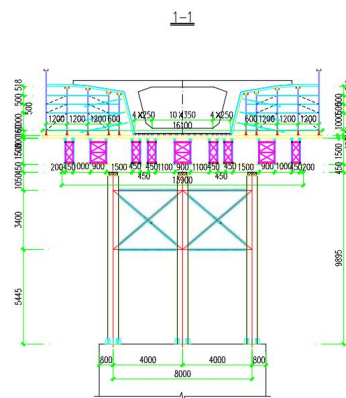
Support scheme transverse layout of the bridge(side pier)
